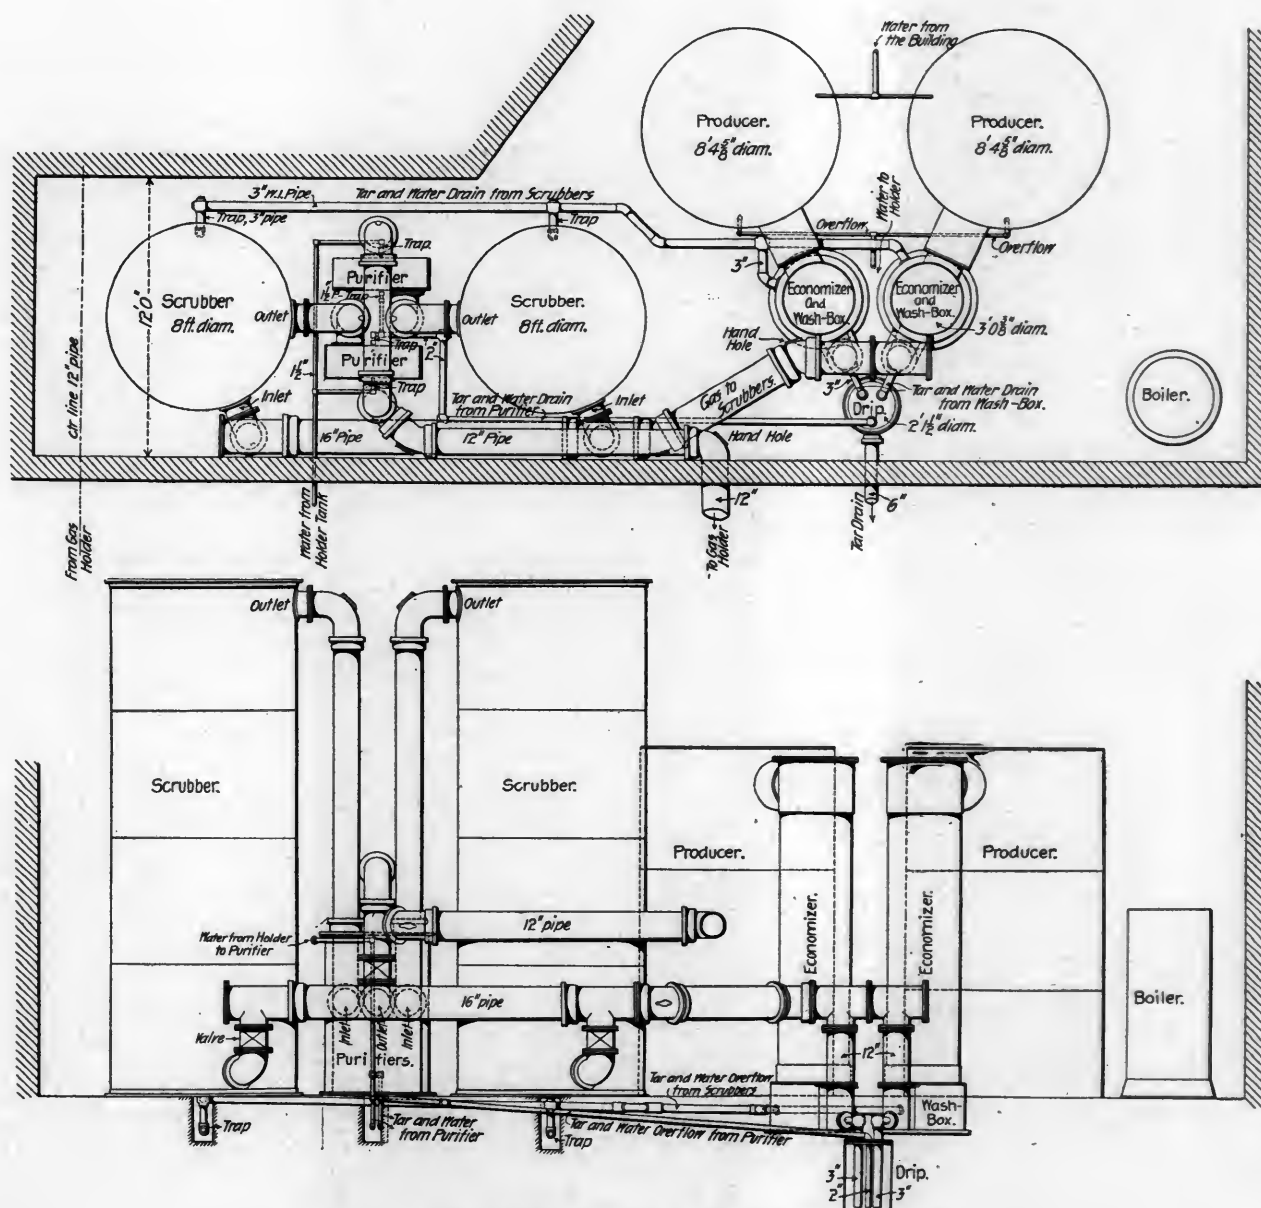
Plan and Side Elevation of the Taylor Gas Producers.
